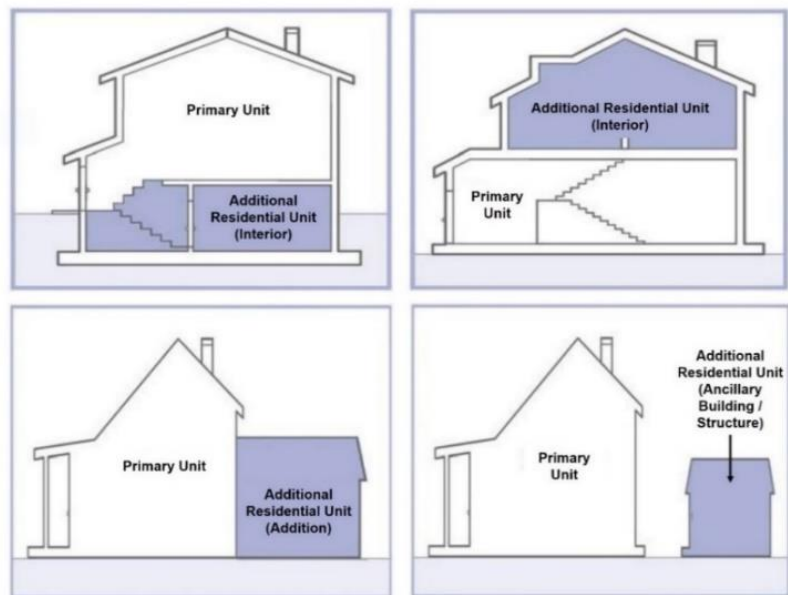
Examples of additional dwelling unit locations (Adapted from Ministry of Municipal Affairs and Housing, 2019)
